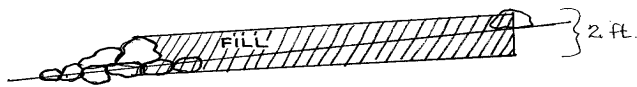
Typical small rocked ford construction with roadway excavation, rock fill, end walls and apron
